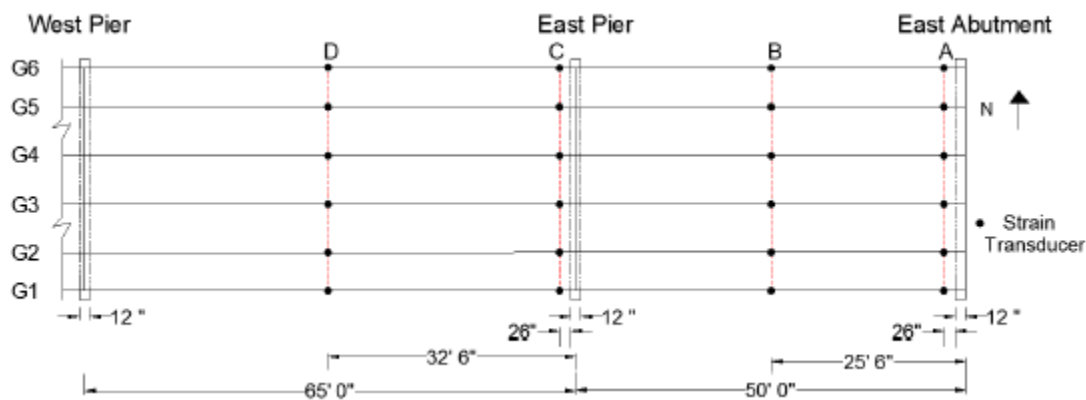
Sioux County Bridge Plan View of Strain Transducer Locations
